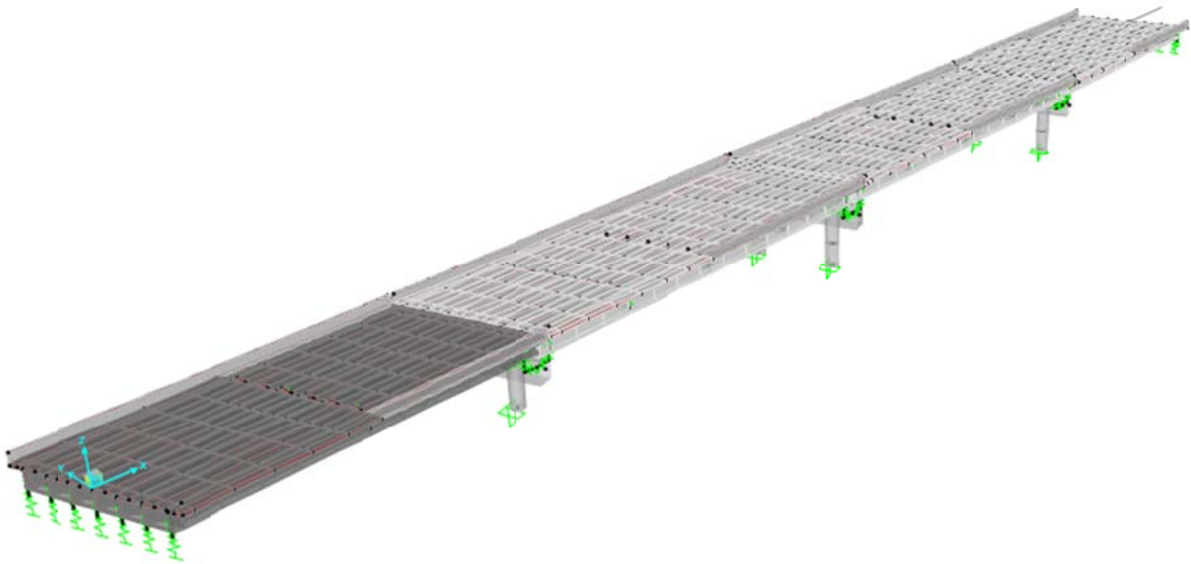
An extruded view of the full bridge model with barriers and staggered webwalls.
